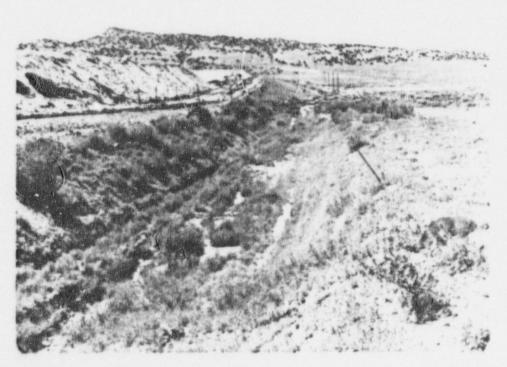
CLOSE-IP VIEW OF DOWNSTREAM SLOPE, LOOKING FROM NORTH TO SOUTH, NOTE SEEPAGE COLLECTOR DITCH AT THE OF STARTER DAM.
